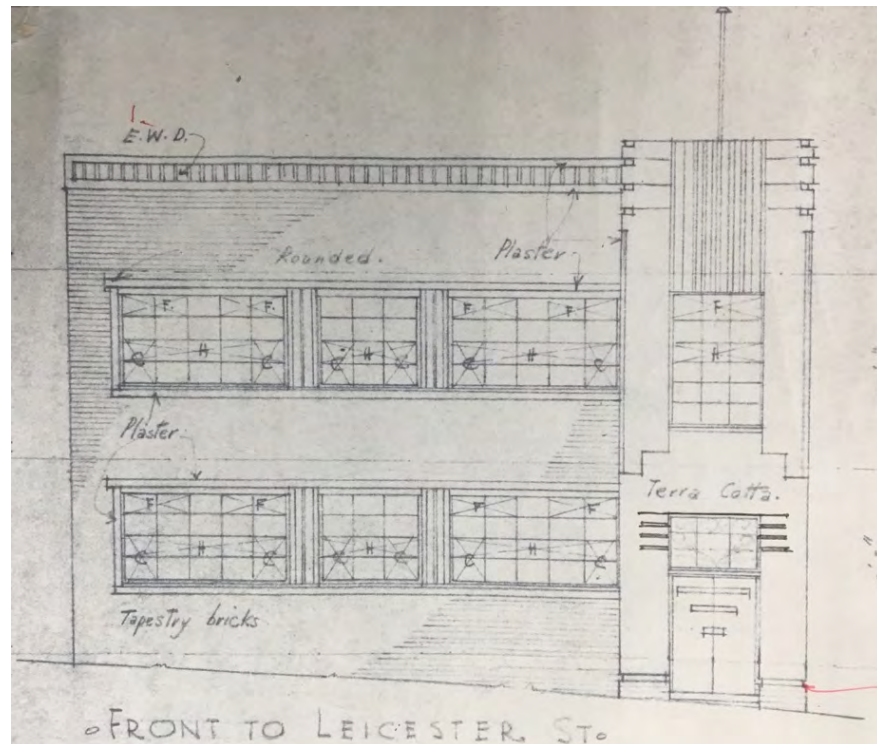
The façade to 174-178 Leicester Street as shown on the 1940 permit drawings. Source: Public Records Office Victoria.
